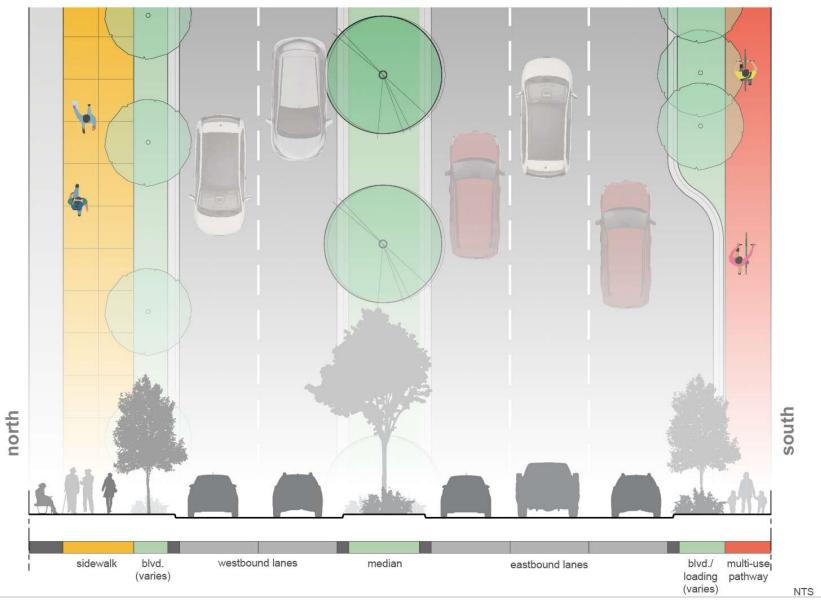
SASKATCHEWAN DRIVE CROSS SECTION - DOWNTOWN
